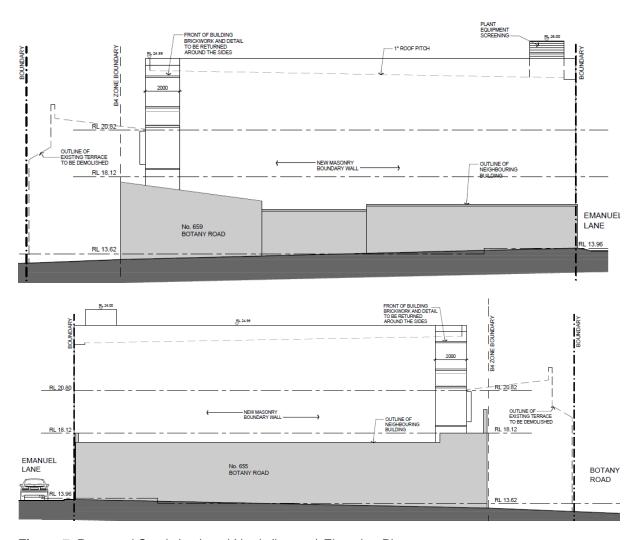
Proposed South (top) and North (bottom) Elevation Plans
